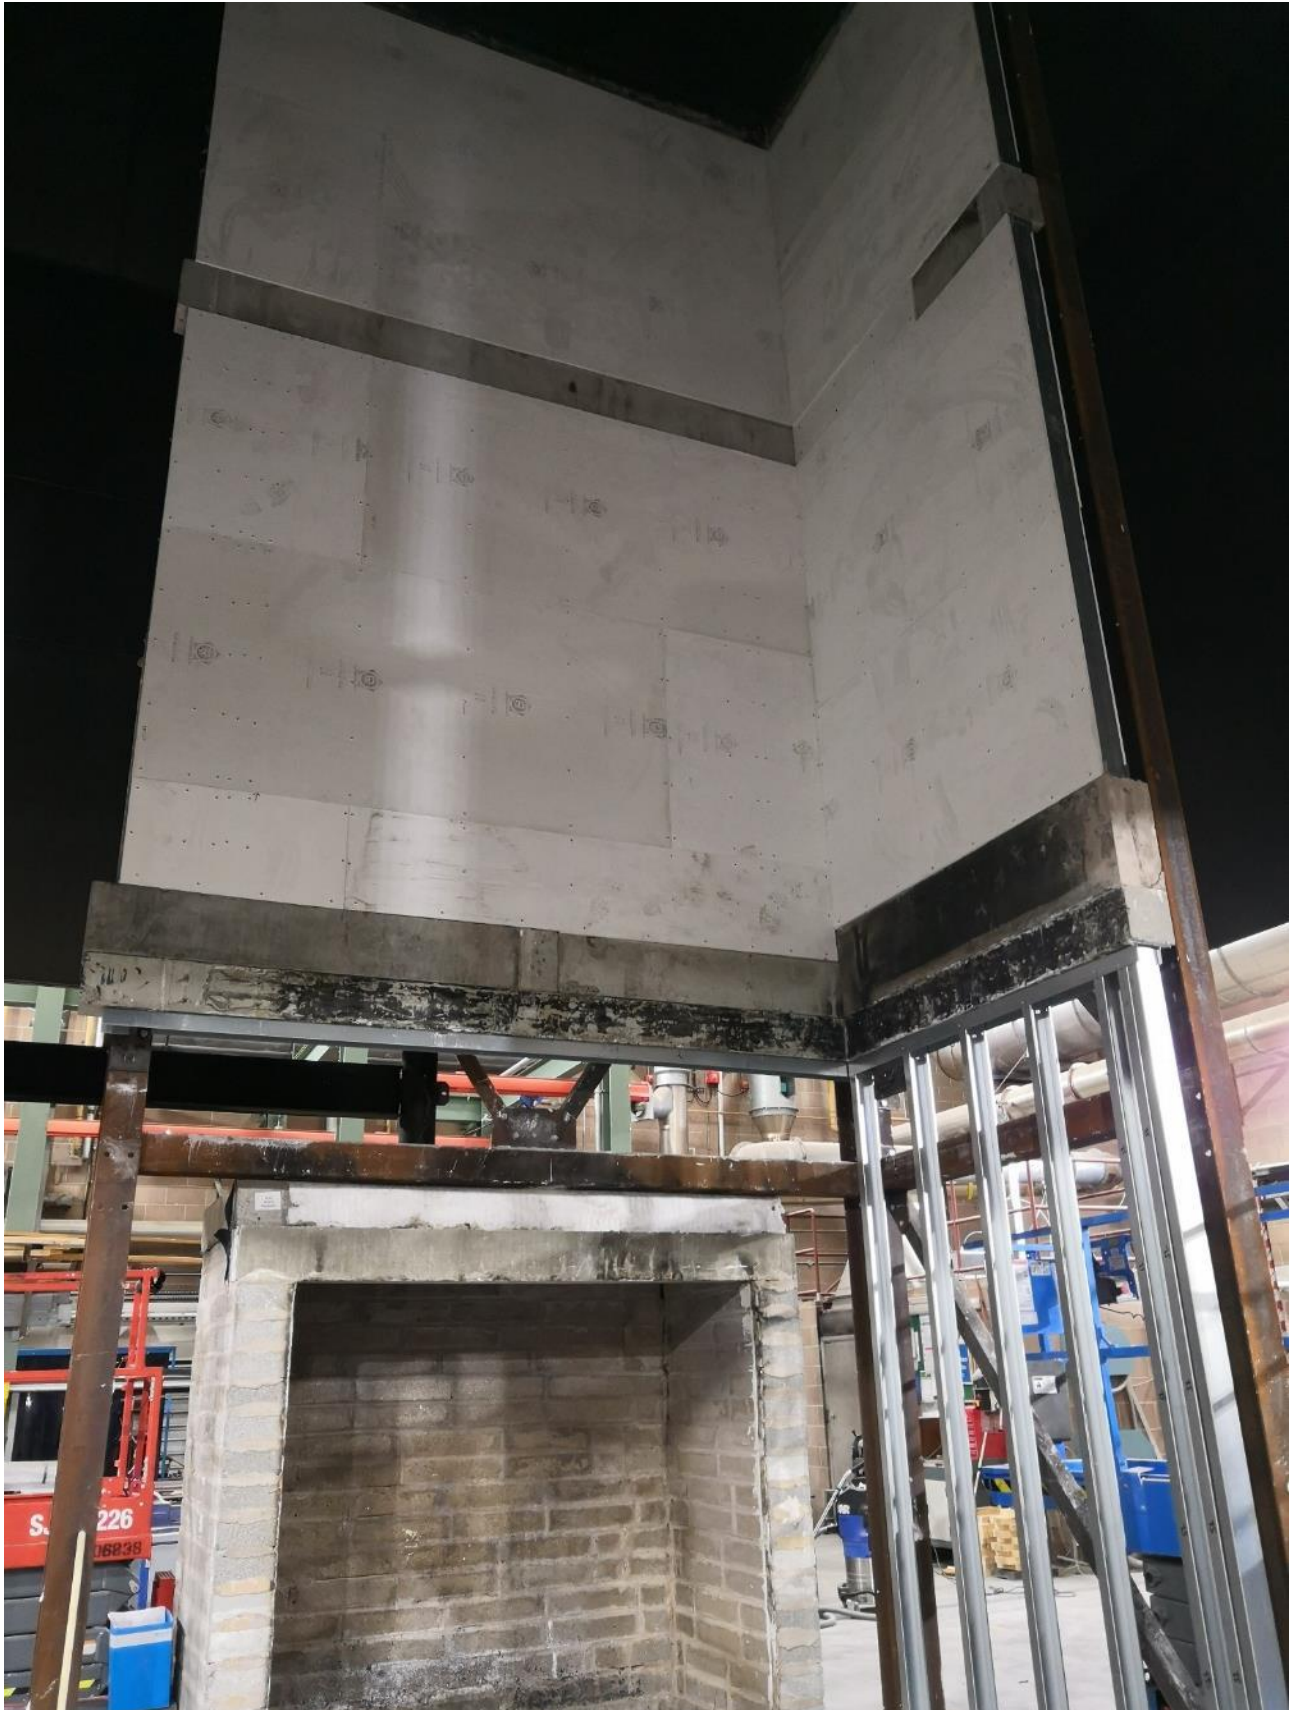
Insulation of SFS Kingframe and sheathing board layer during construction.
